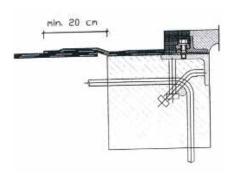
Waterproofing with polymer waterproofing courses on transient area egde cap/track
